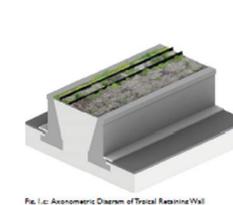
c: Isometric Diagram of Trail Retaining Wall
